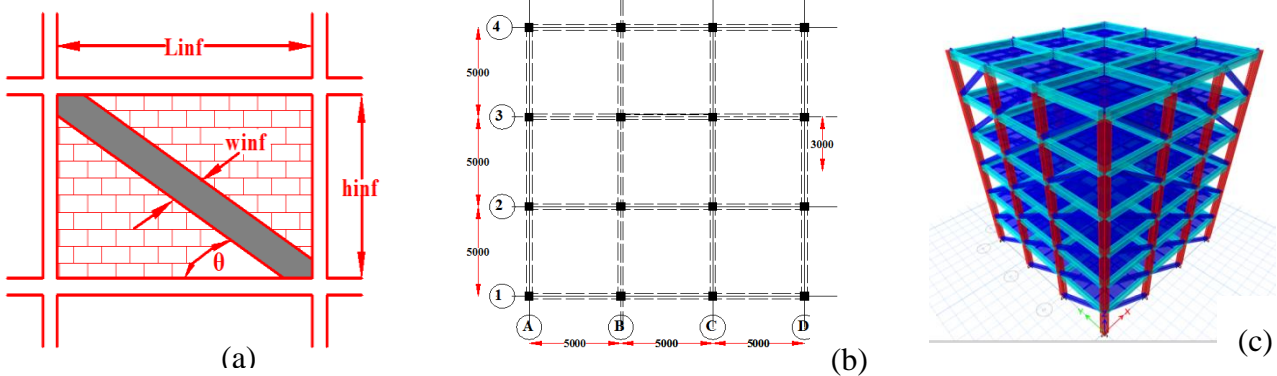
(a) Typical infill modelling, (b) Plan of the building and (c) ETABS 3D Model
